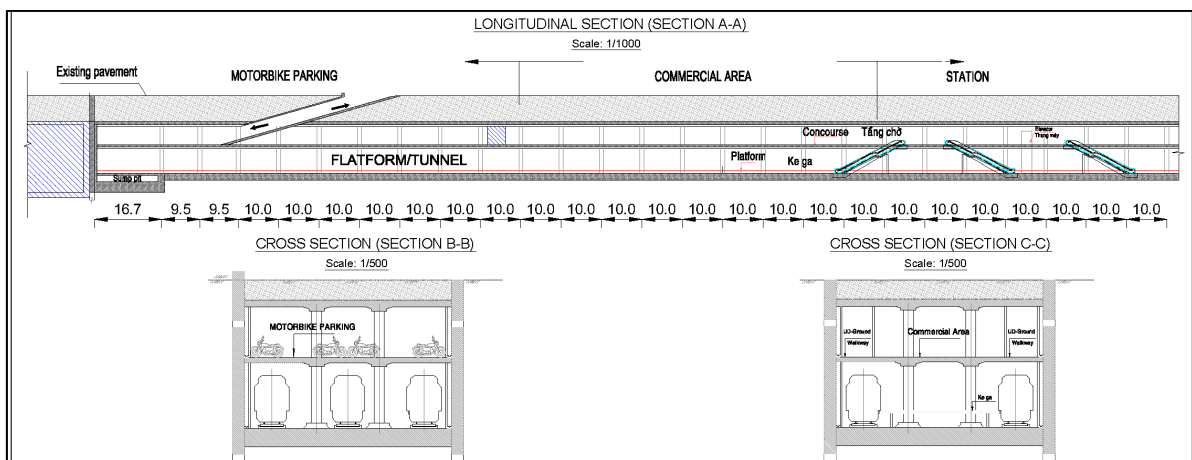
Section Plan of Underground Parking & Commercial Facilities of Tan Kieu Station
